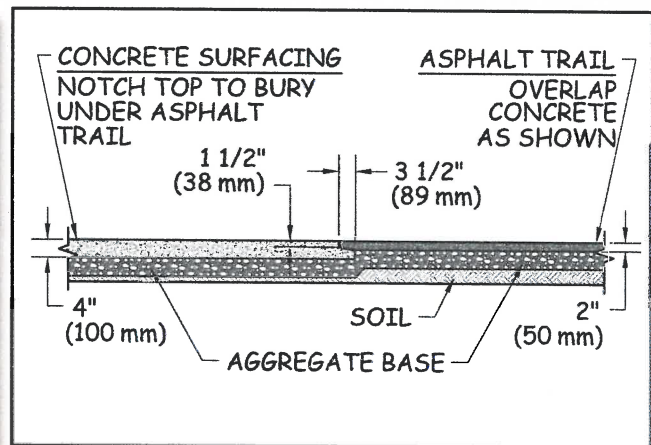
Differential settlement is less likely to occur between adjacent asphalt and concrete walking surfaces if the asphalt is overlaid onto a notch of the adjacent concrete surface.
